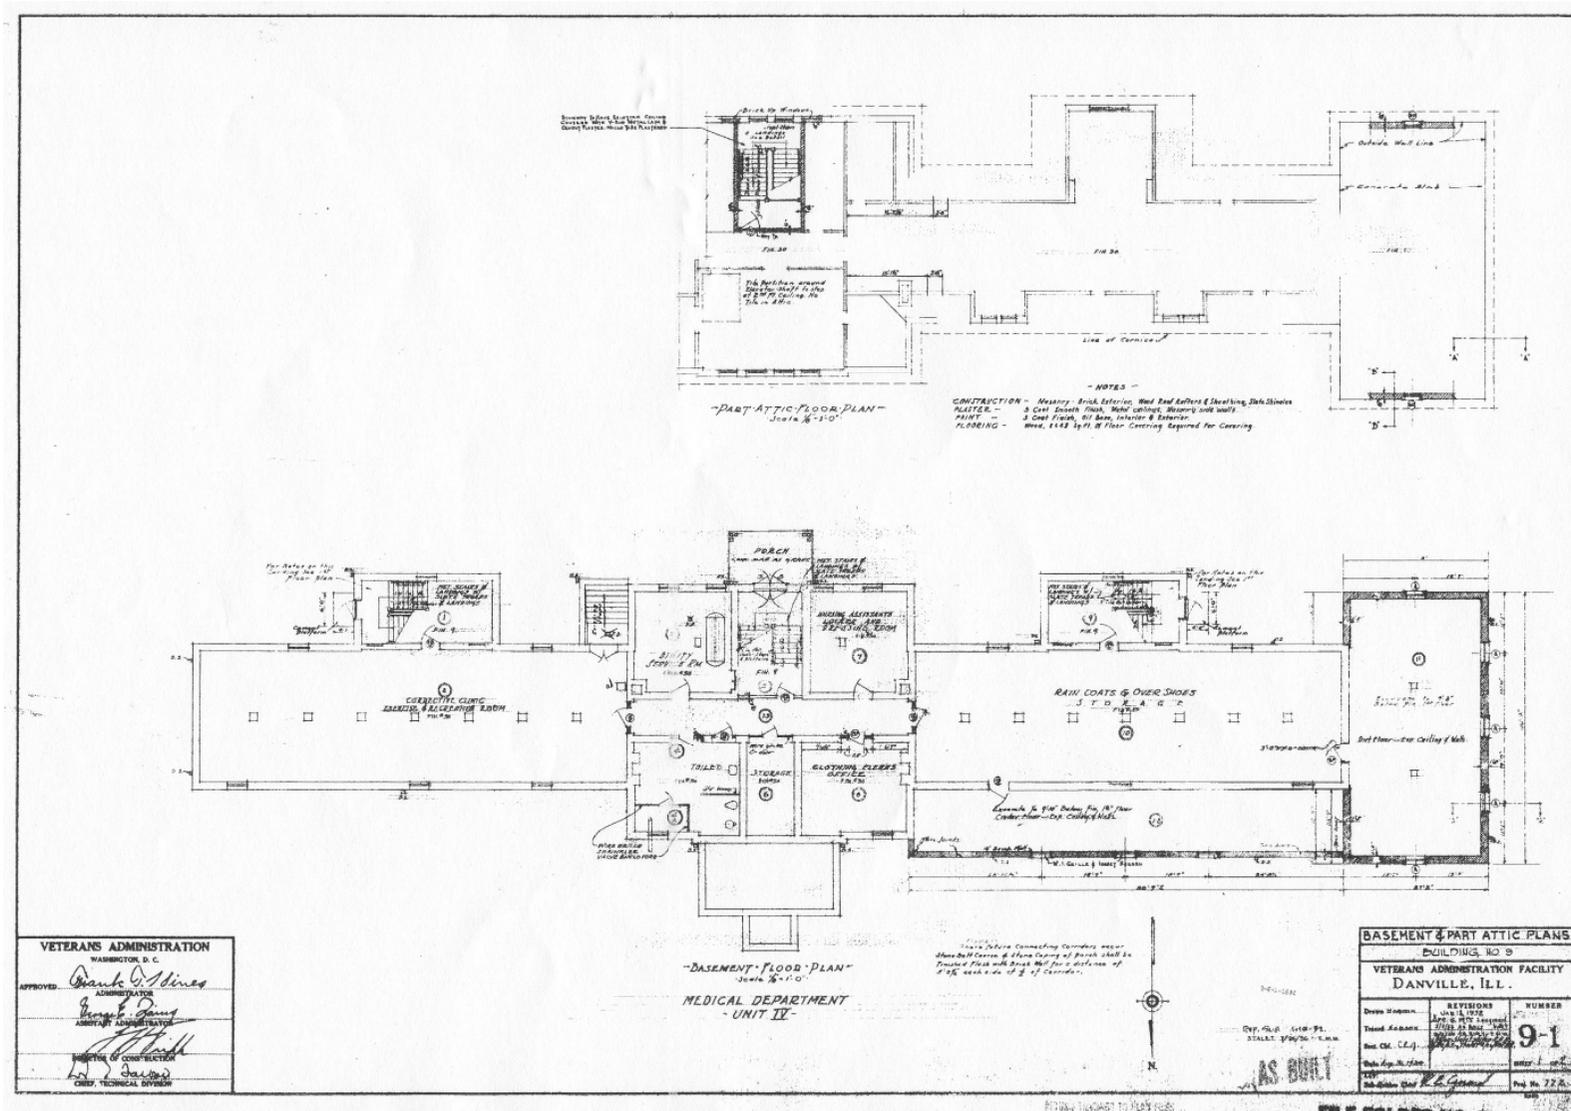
Basement and partial attic plans of Building 9, showing modification undertaken by the VA in 1934 and later.
